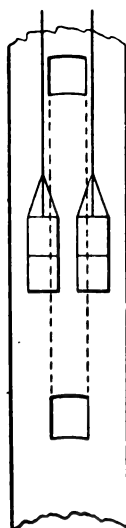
Arrangement to secure effective air-passages at "meetings."
